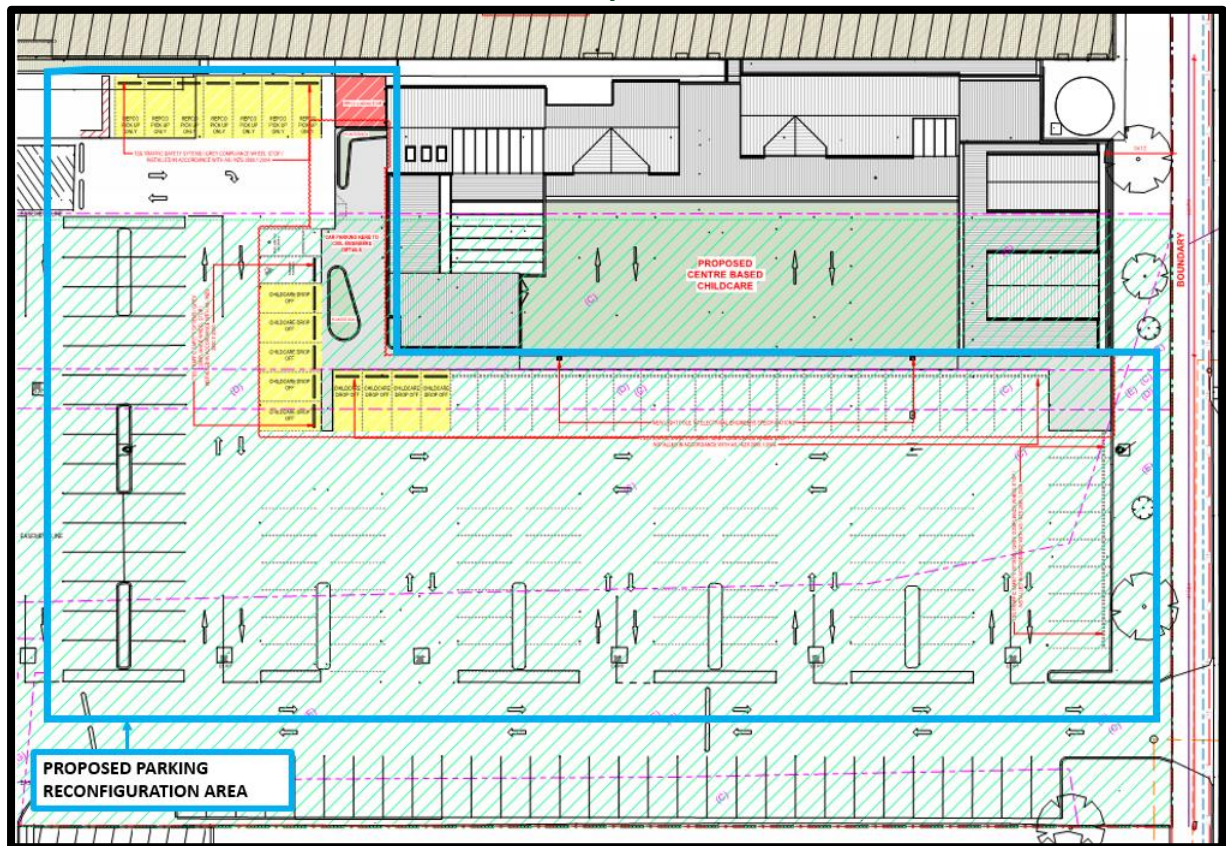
Proposed car-parking layout (Source: 5 Canons Architecture, 2021)
